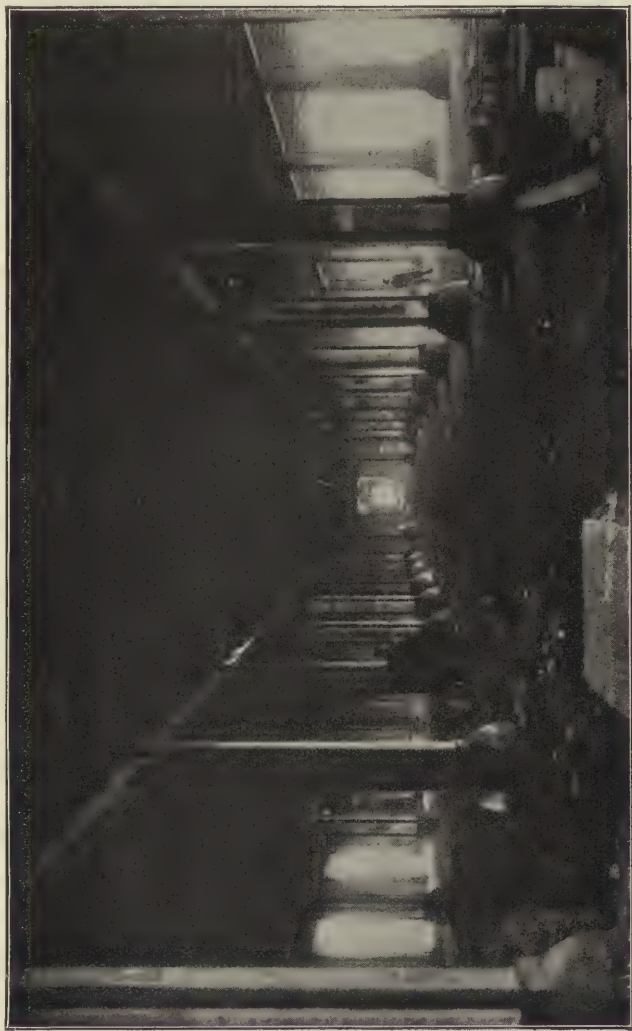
Interior of a Shed, showing Columns and Floor Beams.
